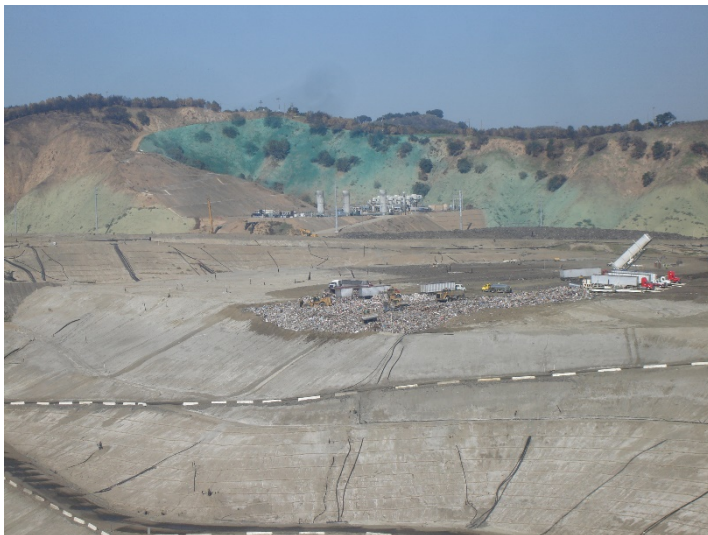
Basin A Outlet Westside Drainage Channel:
